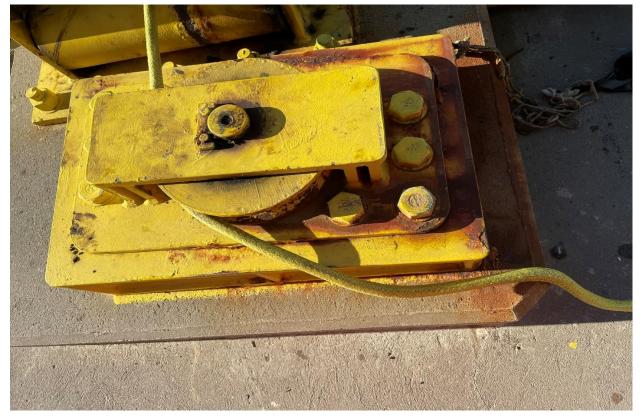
Corrosion of sheave. Note rust stain in concrete pedestal below.
